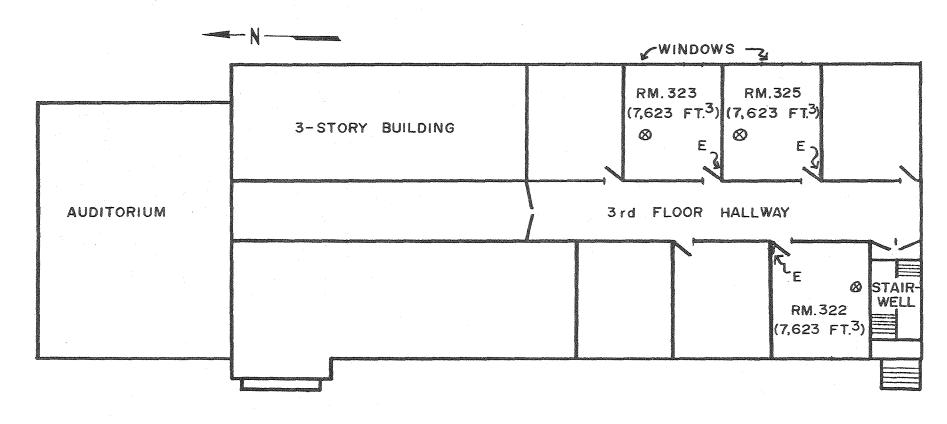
OAKLAND GARDEN ELEMENTARY SCHOOL QUEENS, NEW YORK
